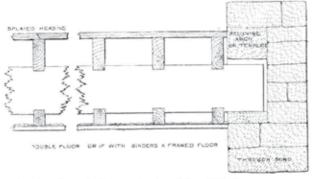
Section through Joists, showing Side of Binder supported by Wall.
